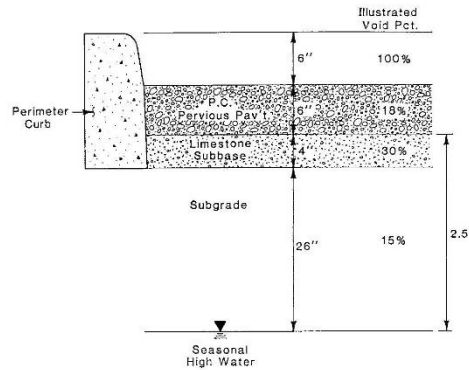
Schematic of pervious concrete pavement designed as stormwater retention system (1 in. = 25.4 mm).
